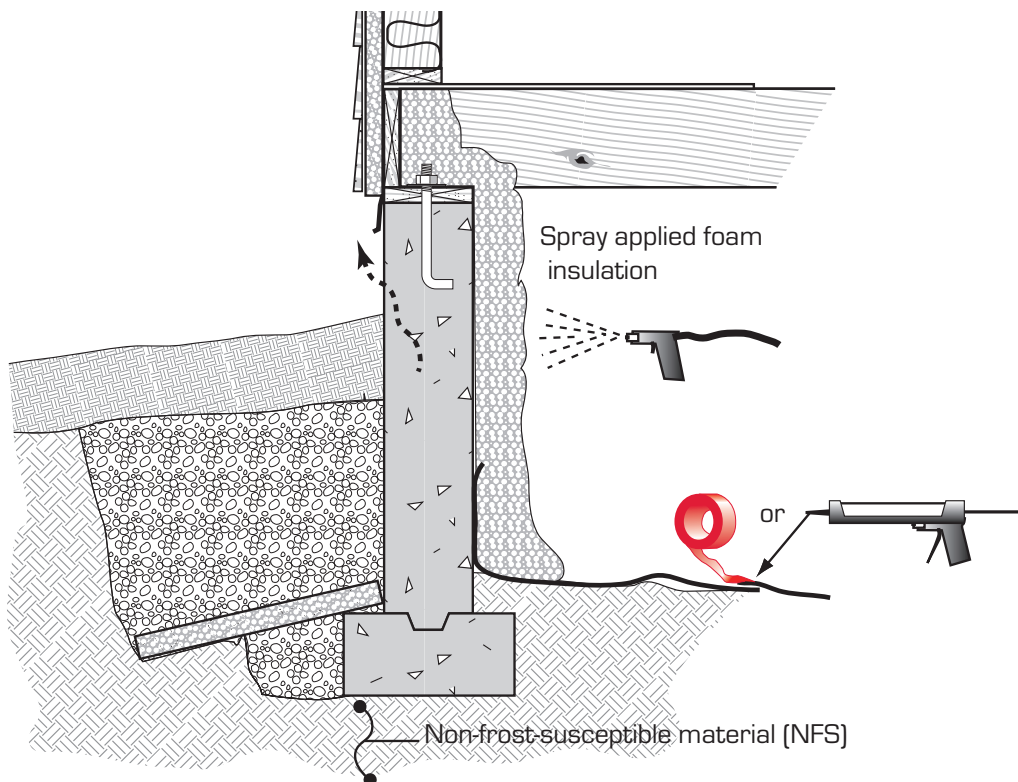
If the foundation is insulated on the inside, moisture can escape above ground outside.
